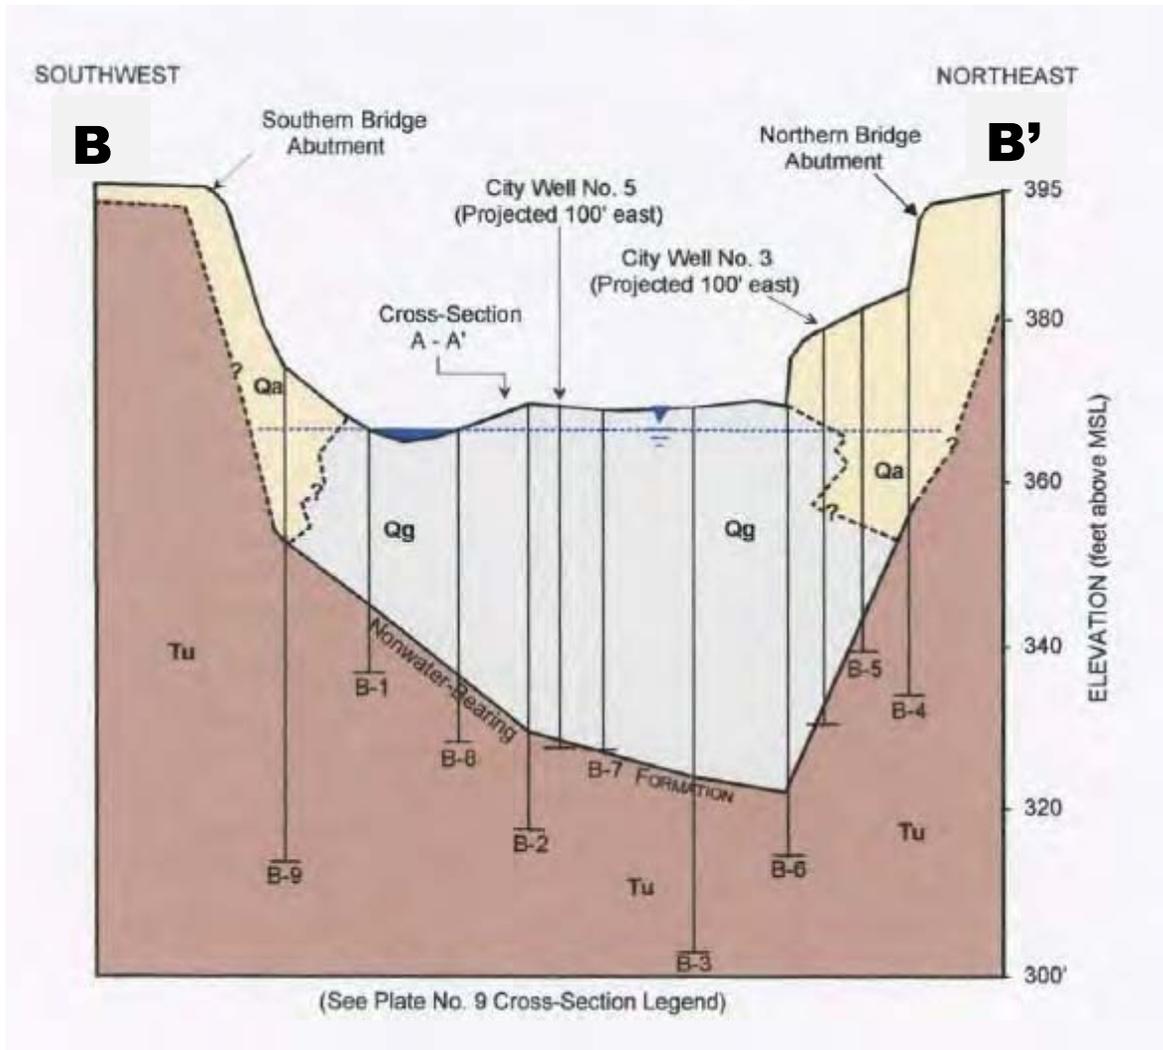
Alisal Road Bridge Boreholes – Cross Section B-B' (Adapted from Hopkins, 2003).
